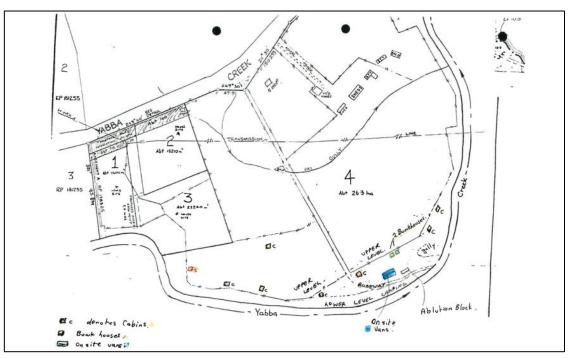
Approved Site Plan (Source: Town Planning Consent Permit document - reference TPC-77, 1994)
